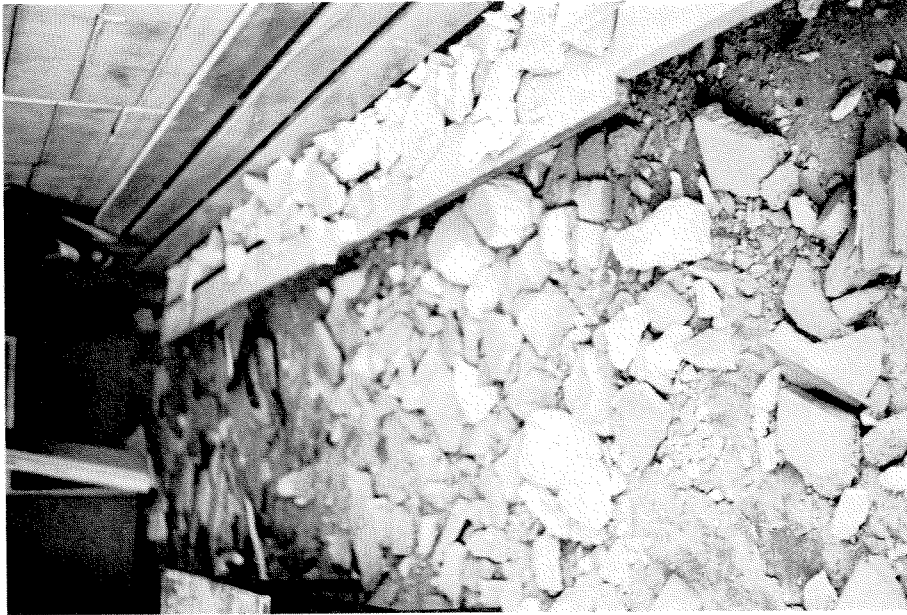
Fallen debris from concrete-block wall. San Fernando Juvenile Facility.
